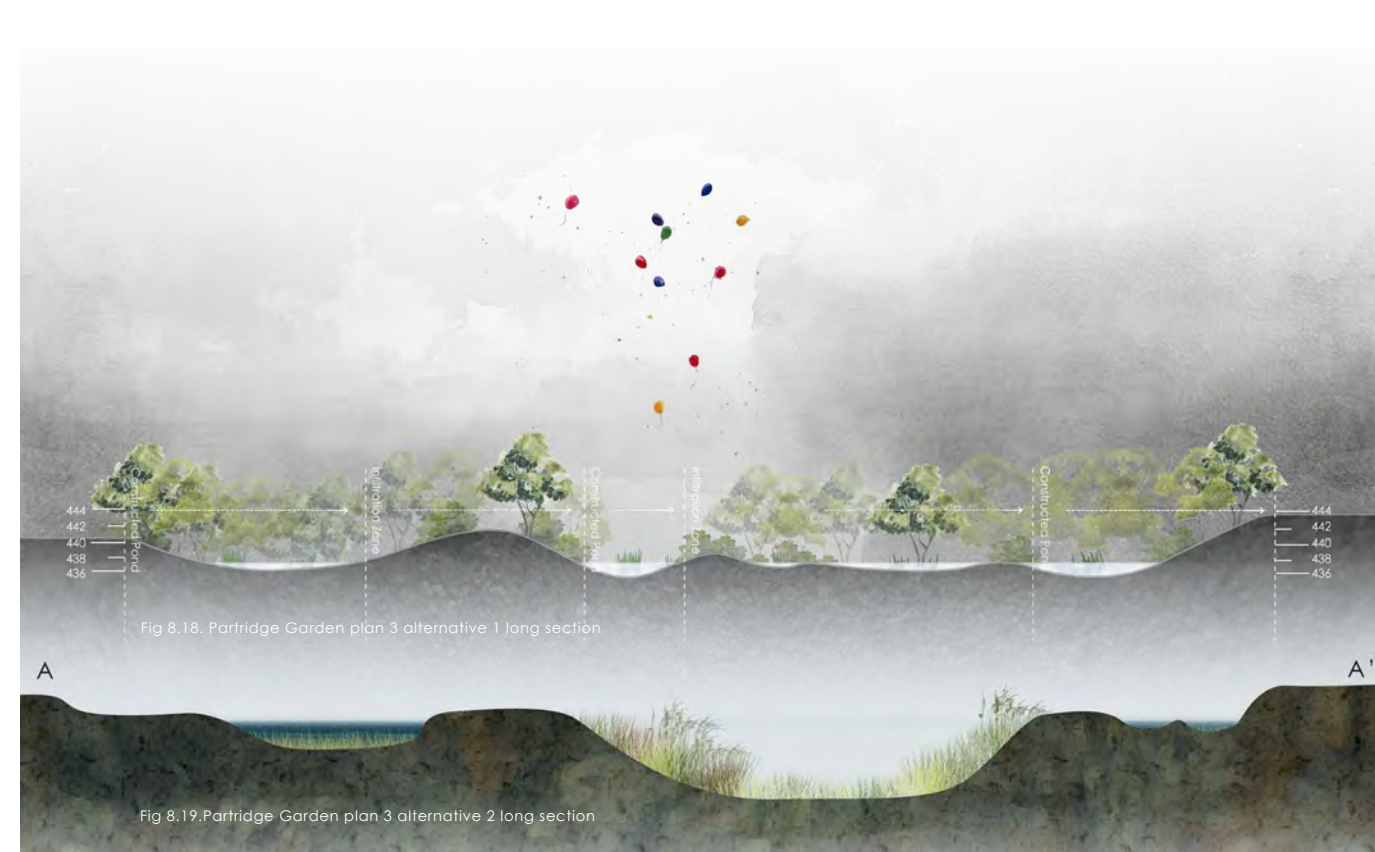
Partridge Garden plan 3 alternative 1 long section
